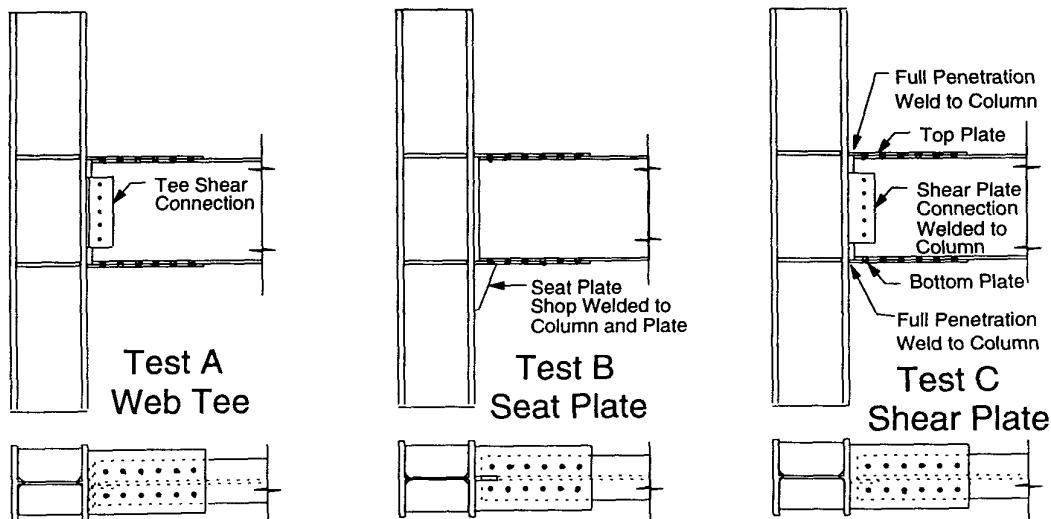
Test Specimens for Bolted Top- and Bottom- Plate Connections
